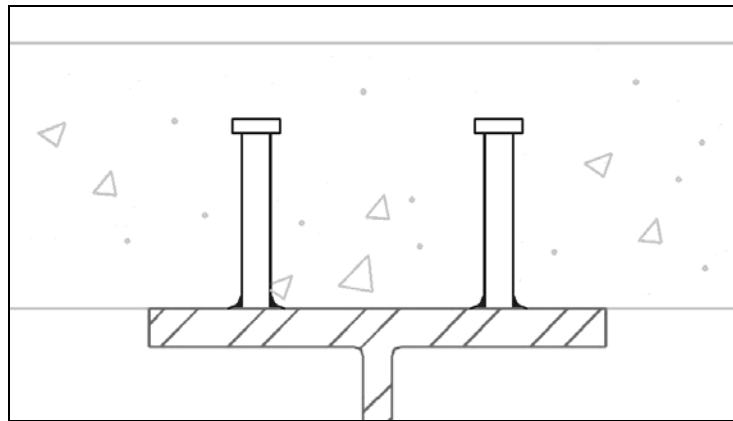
Cast-In-Place Welded Shear Stud
